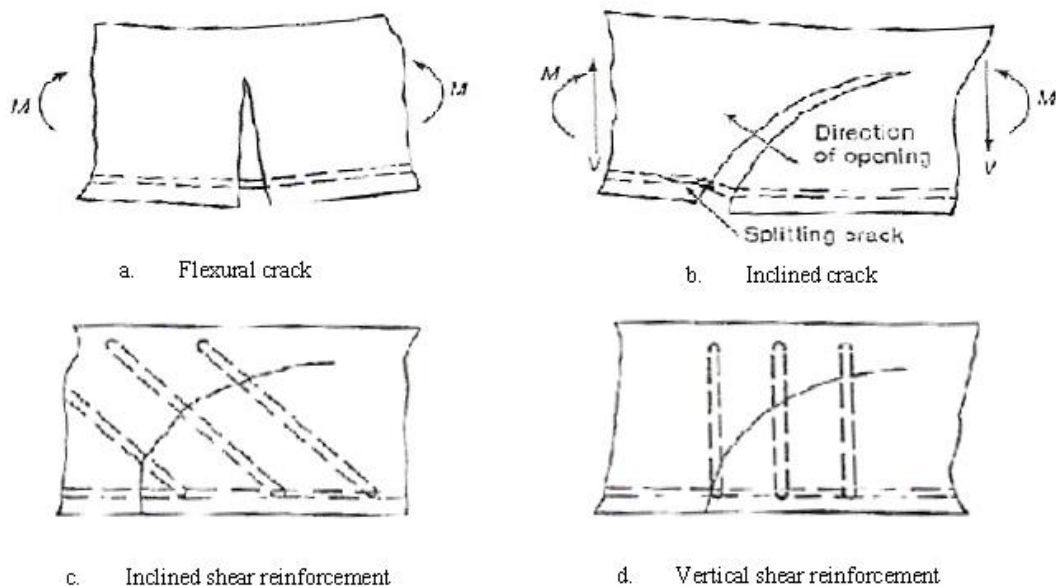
Cracks and reinforcements in a RC beam (MacGregor and Wight 2005).
